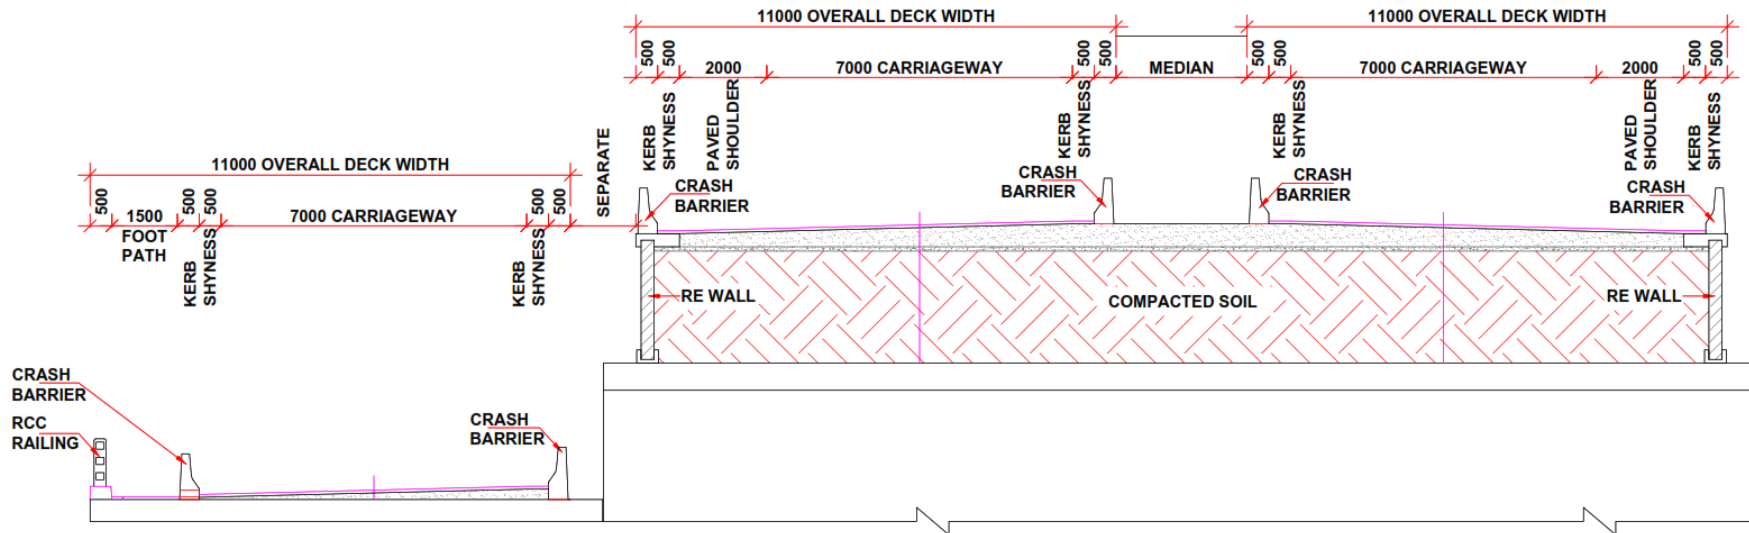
(c): CROSS SECTION OF BRIDGE AT CH.-66+546
